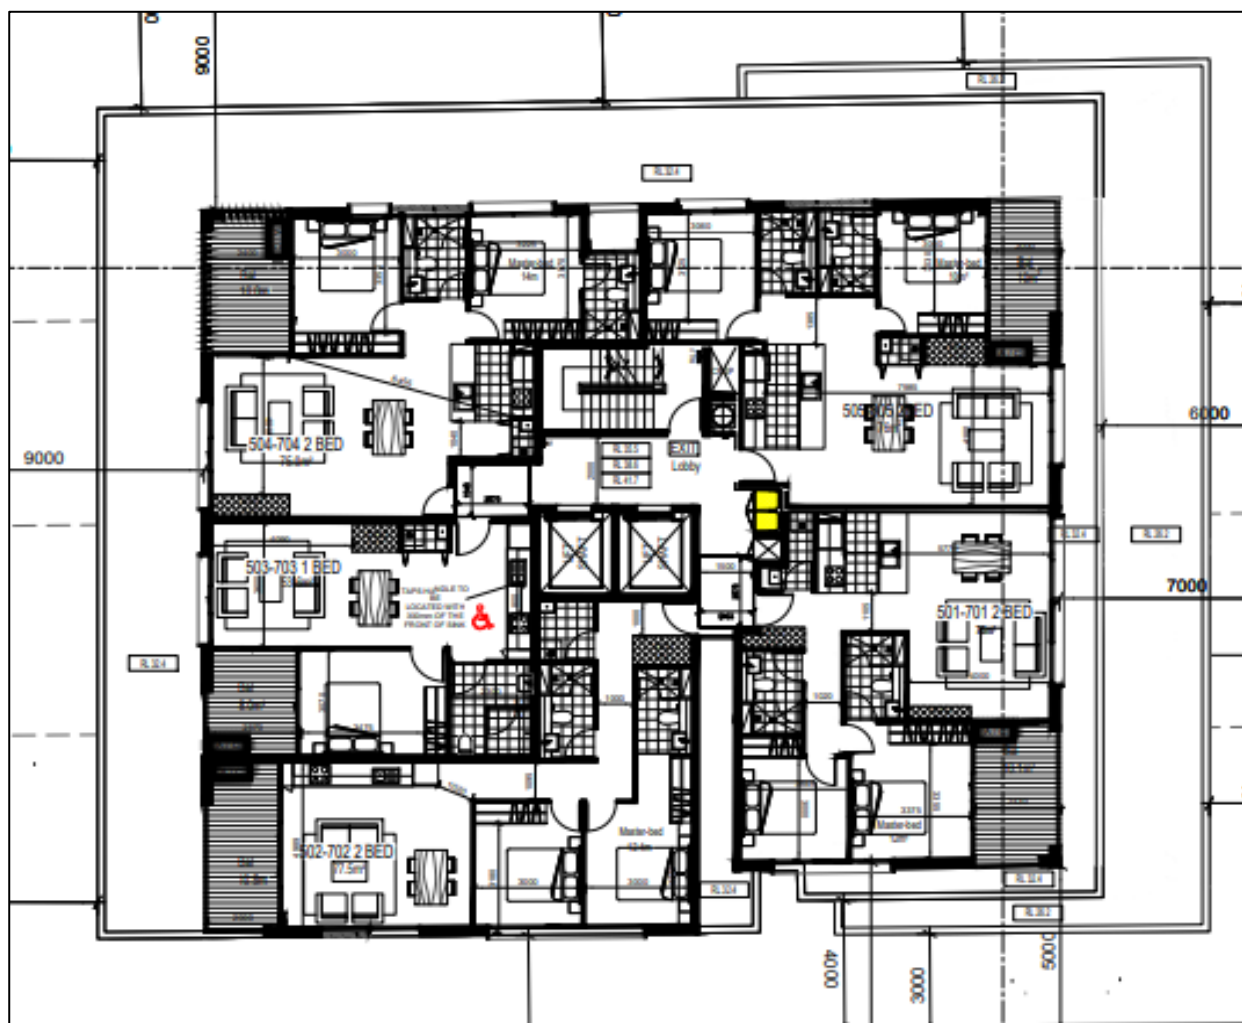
Extract of applicants submitted Level 5-7 Floor Plan.
